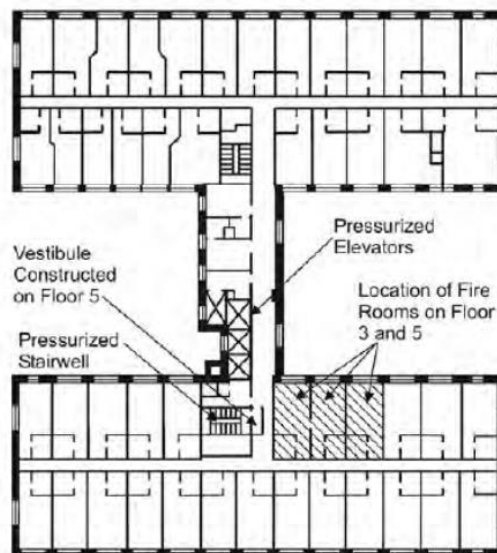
The Henry Grady Hotel. Typical floor plan. Image extracted from [8].
